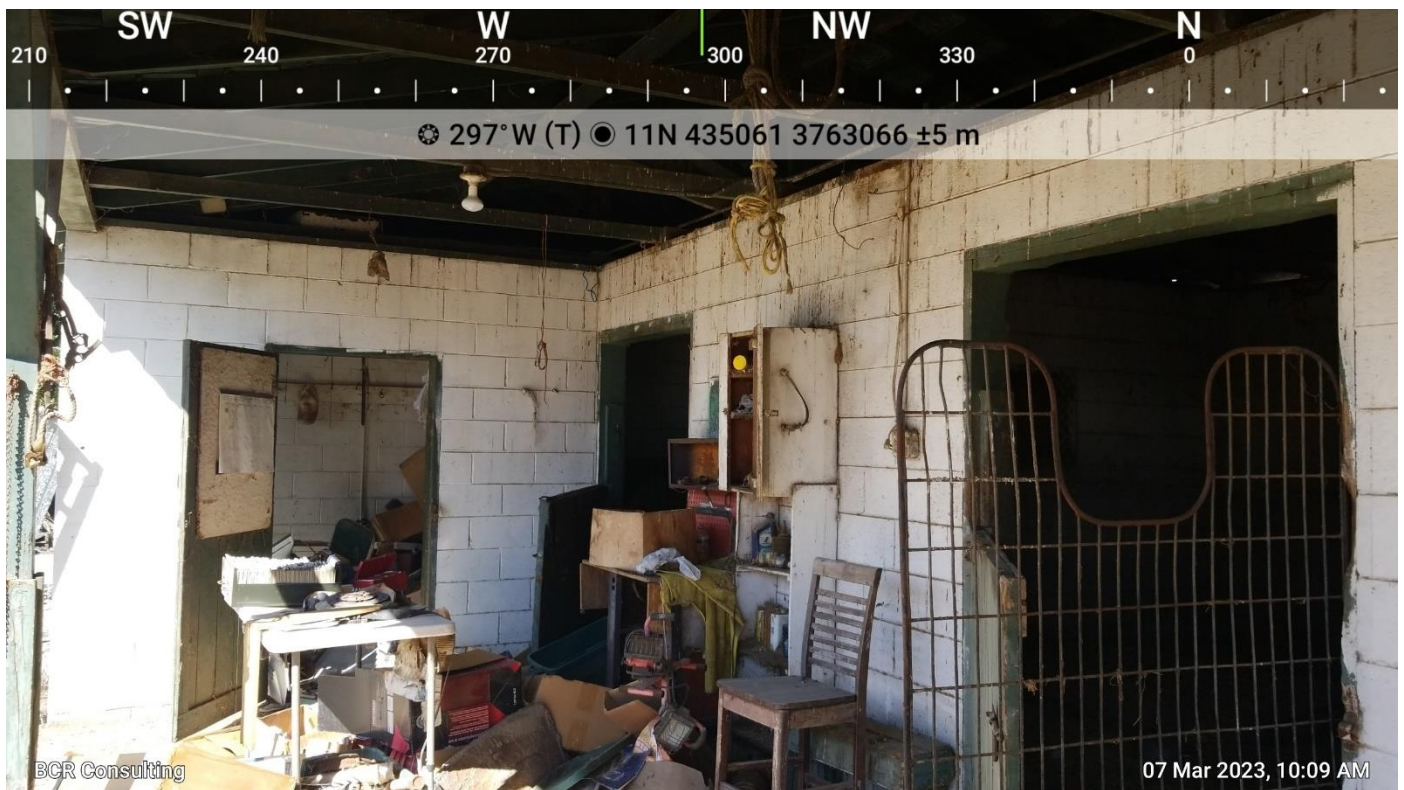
Overview from Covered Stable Yard with Views of Horse Stalls and Office
